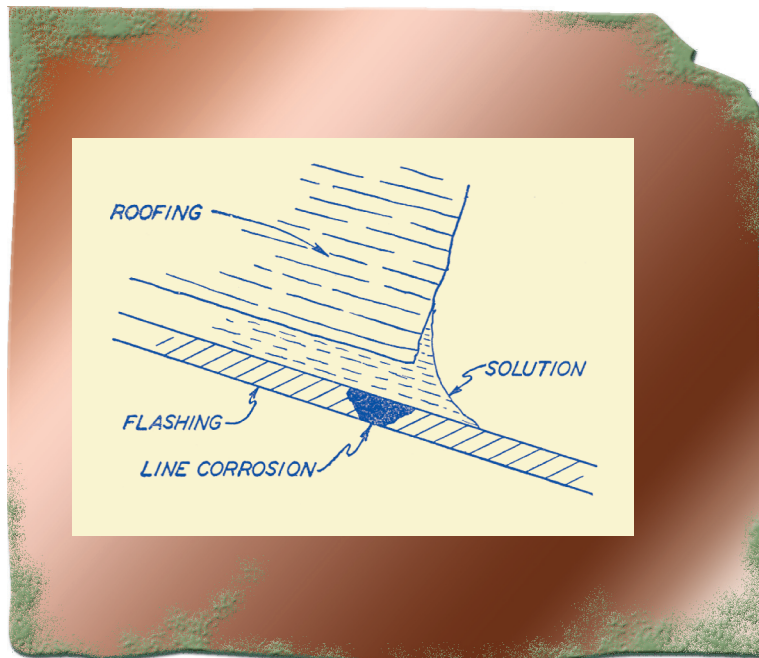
from Research Paper No. 123 is a diagram of open-valley flashing, illustrating the manner in which line corrosion occurs.
